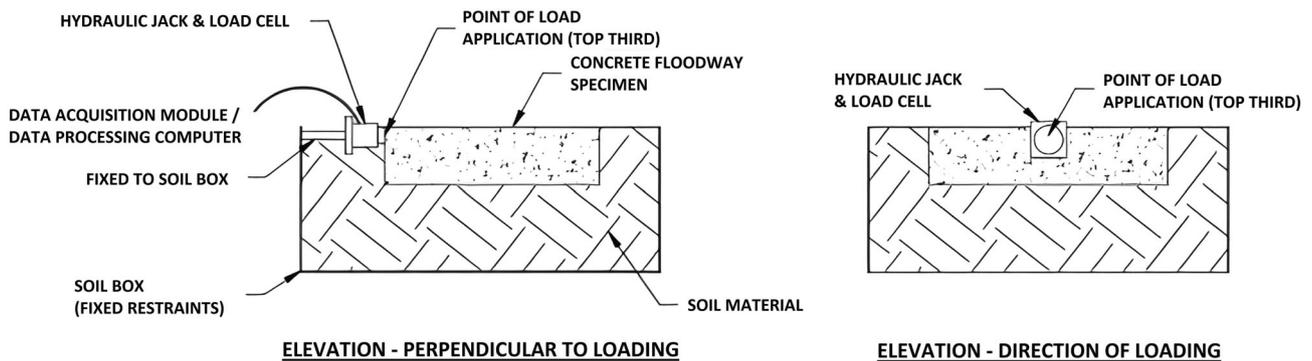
Sketch indicating how the load was applied to the test specimens.
